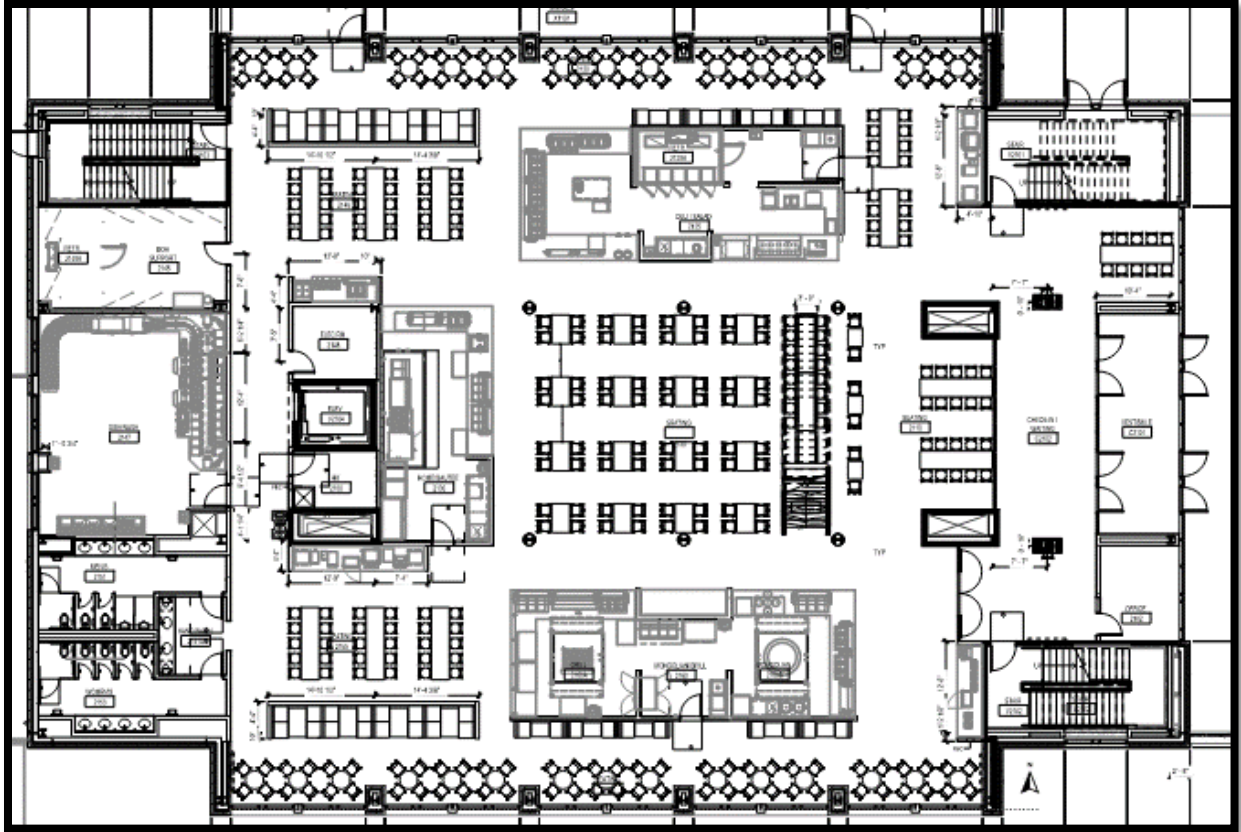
Central Dining Hall "The Edge" Furniture Plan
